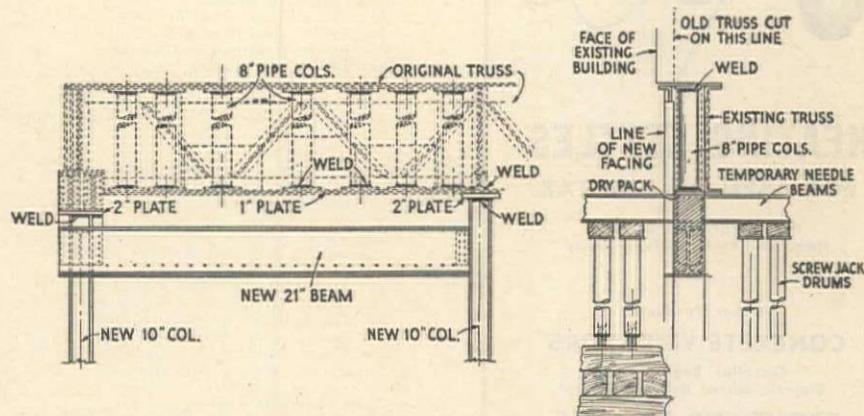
Front view and cross-section showing alterations made in order to set wall back.
